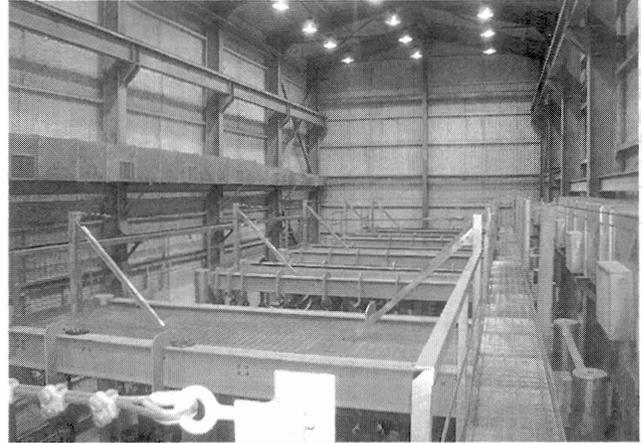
Catwalk with Safety Lines Providing Access to All Top Levels of Storage Racks.
